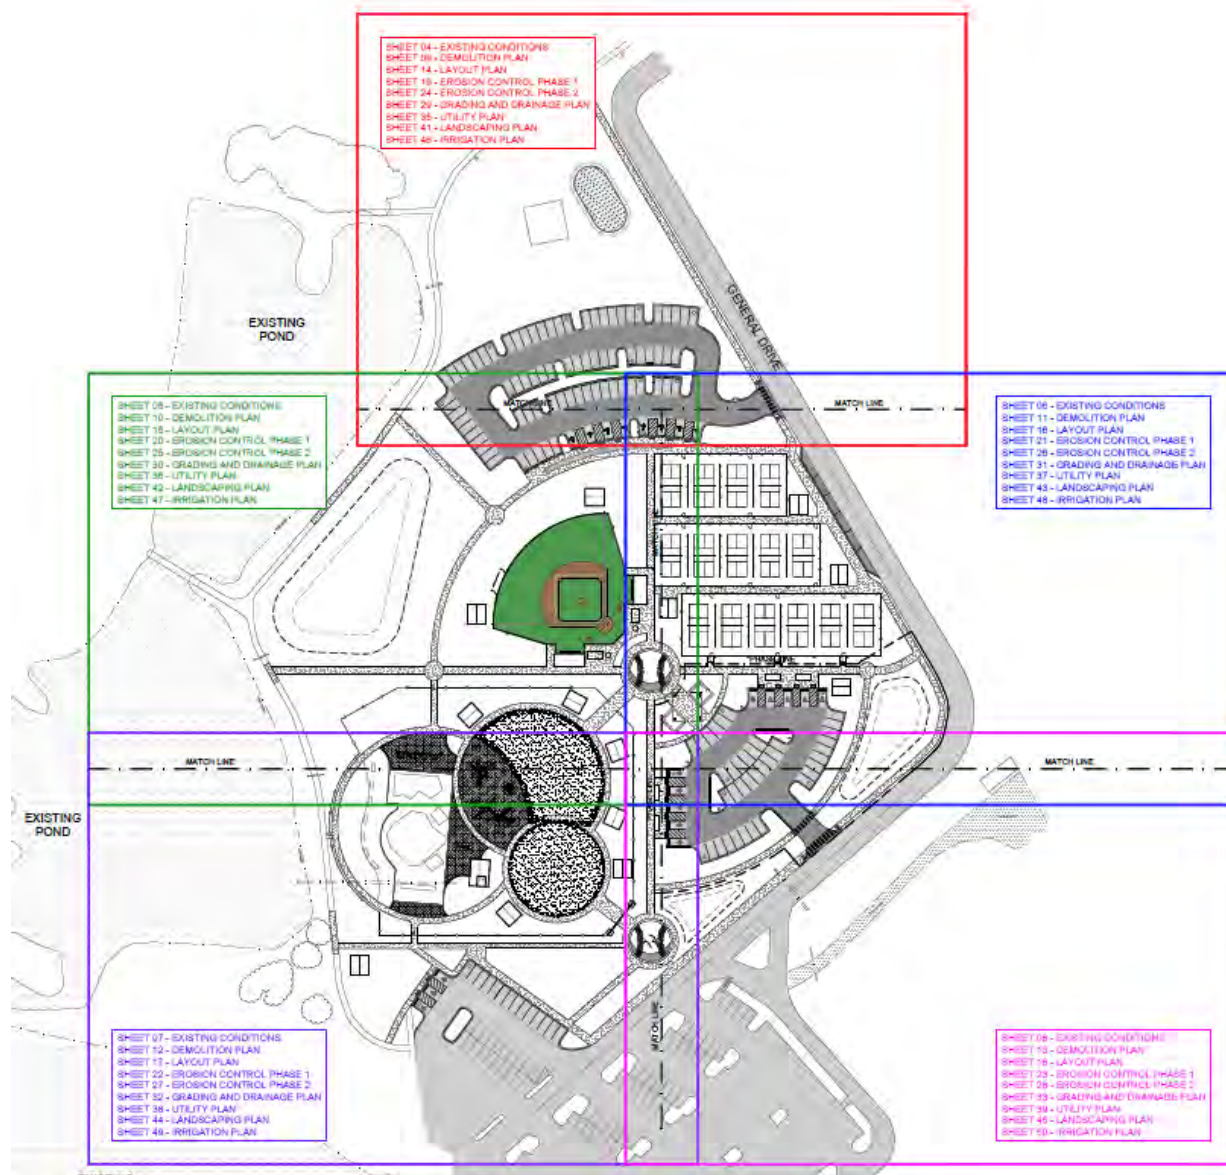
Proposed Site Layout Plan, inclusive of Phase 1 and Phase 2
